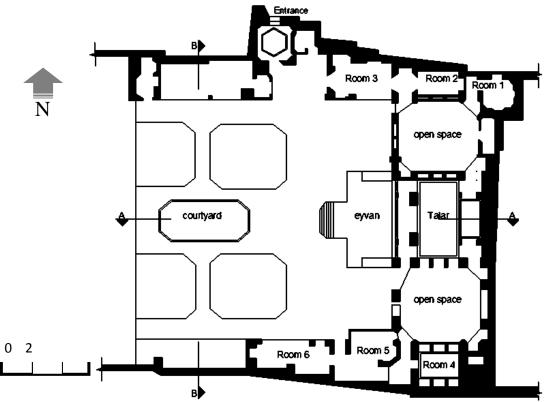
Ground-floor plan of a traditional building in Kashan (University, 2005)
